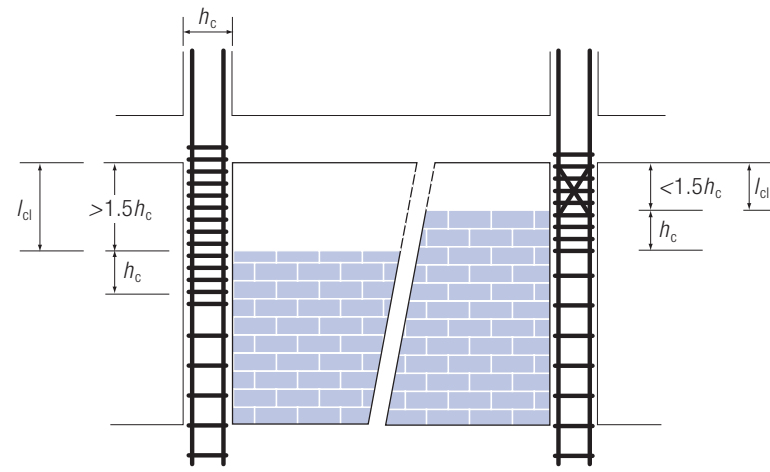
Partial masonry infill – arrangement of shear reinforcement in the columns
